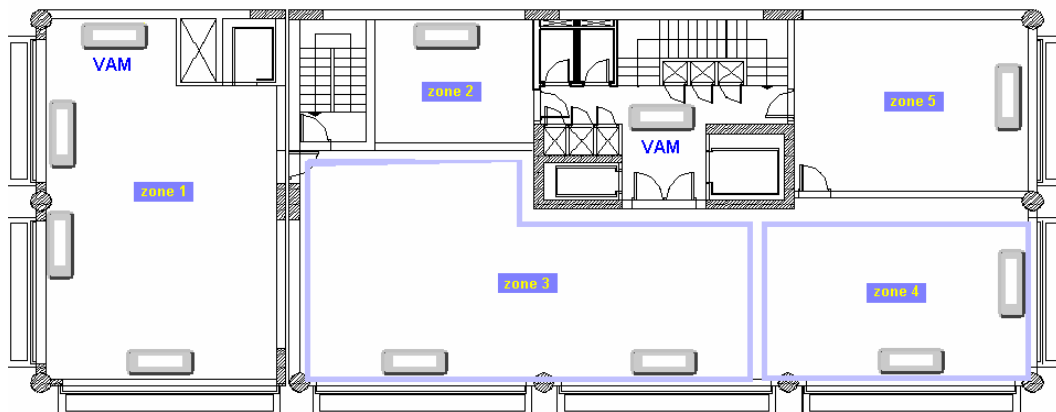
4<sup>th</sup> Floor and thermal zones plan of BYTE
